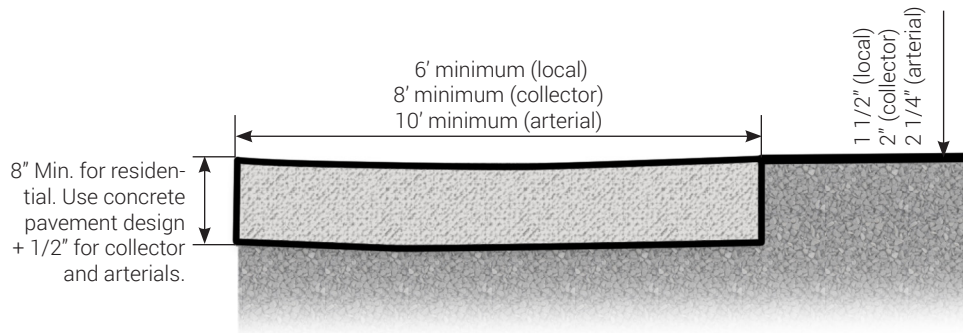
TYPICAL SECTION FOR VALLEY GUTTER
